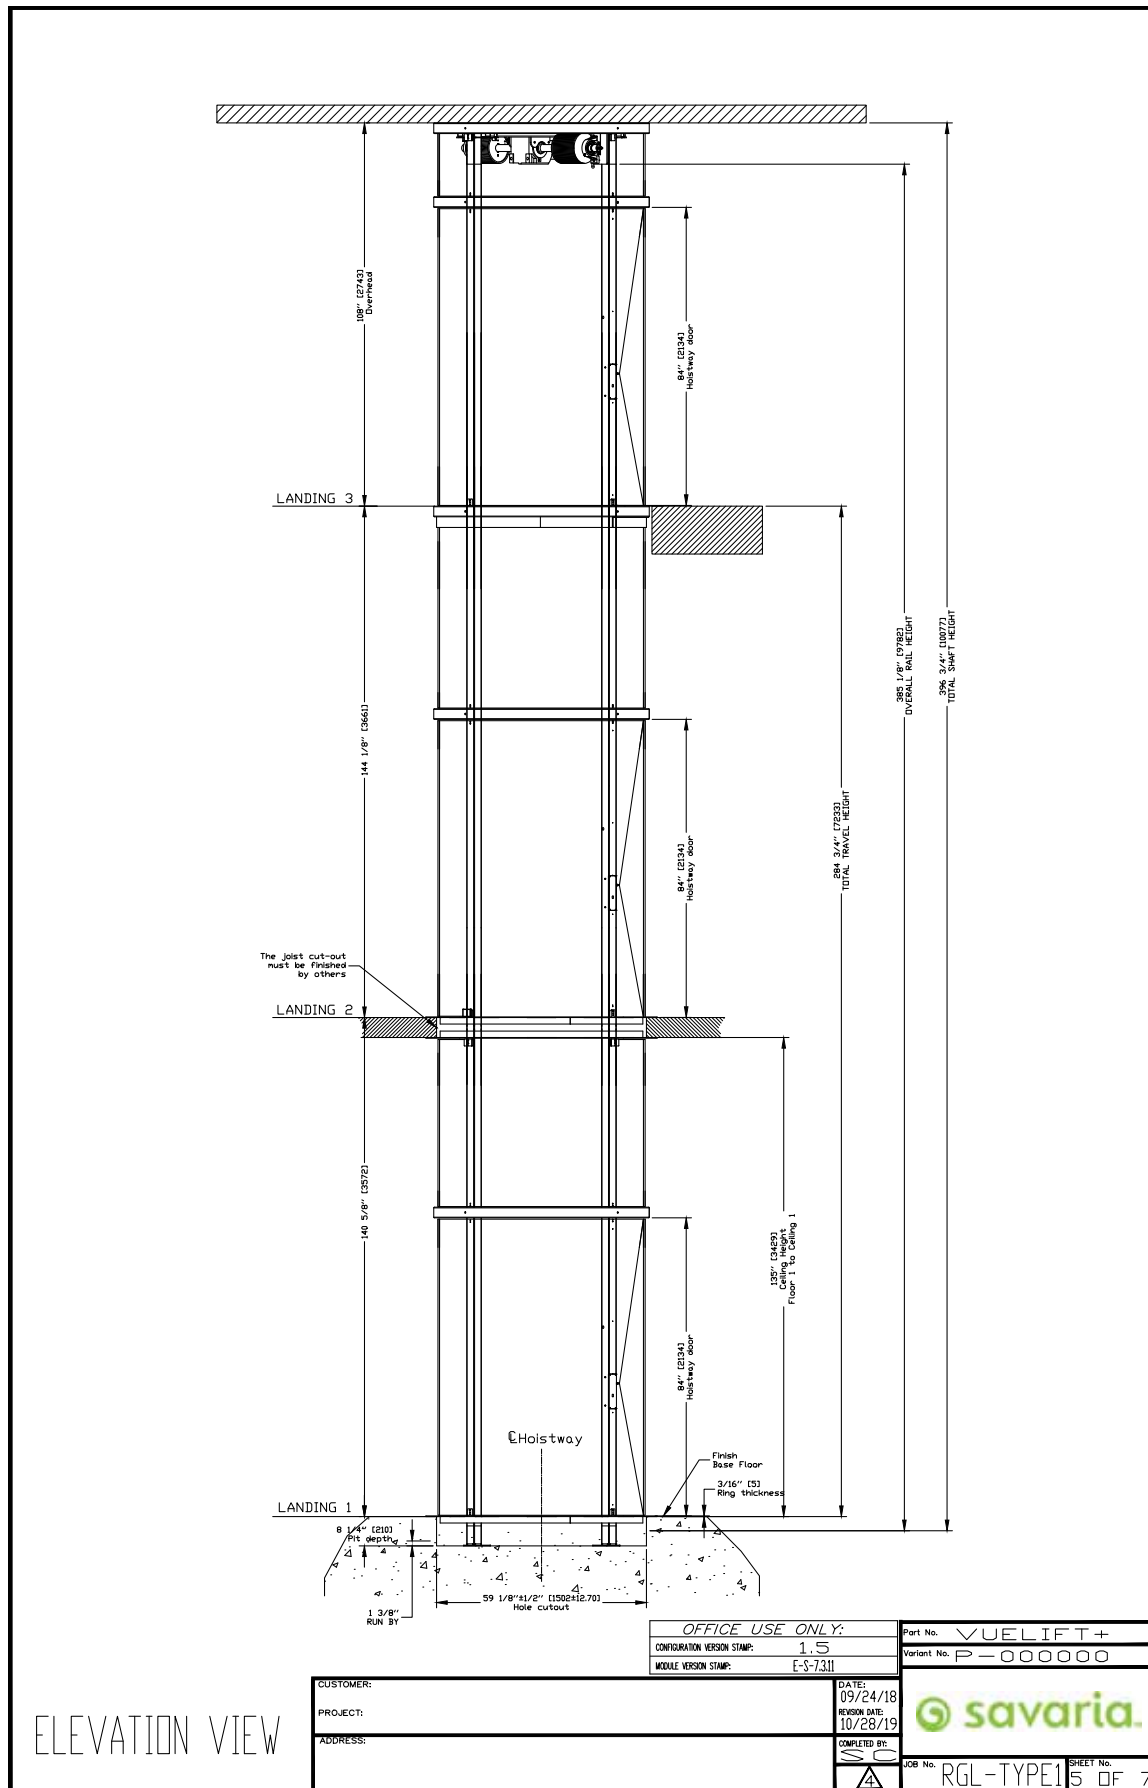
Elevation view (RGL) - extra header rings if floor-to-floor height &gt; 14 ft
